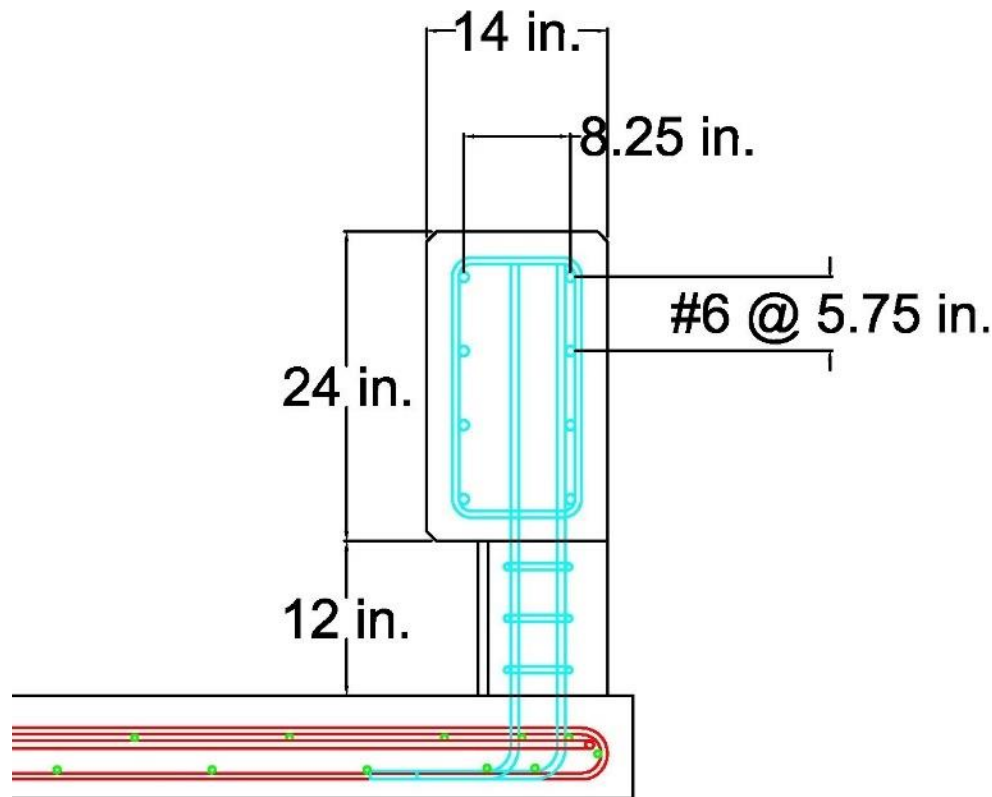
36-in. Open Concrete Bridge Rail Interior Section, Cross Section
